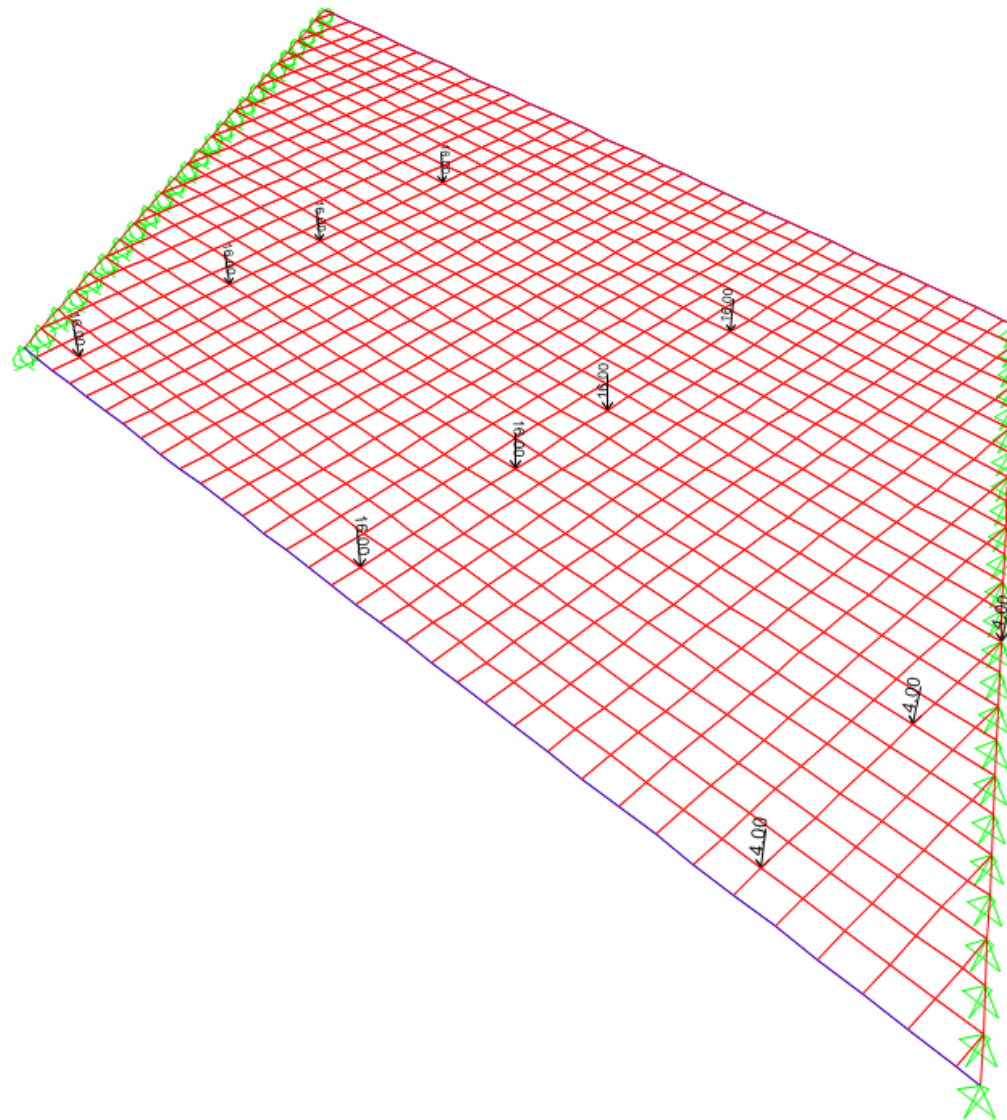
(a): Finite Element Model for a Two-Lane, 36 ft Span Bridge, Angle of Skewness = 30 degrees, Two Railings - Geometry and Loading.
